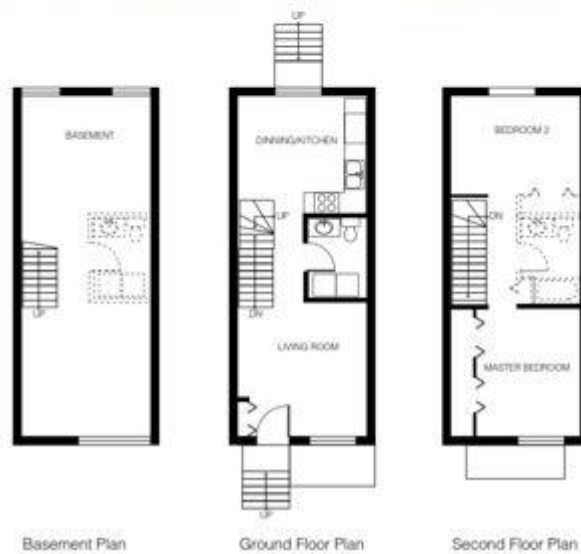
Grow homes and their typical plans of each floor. (URL:4)
